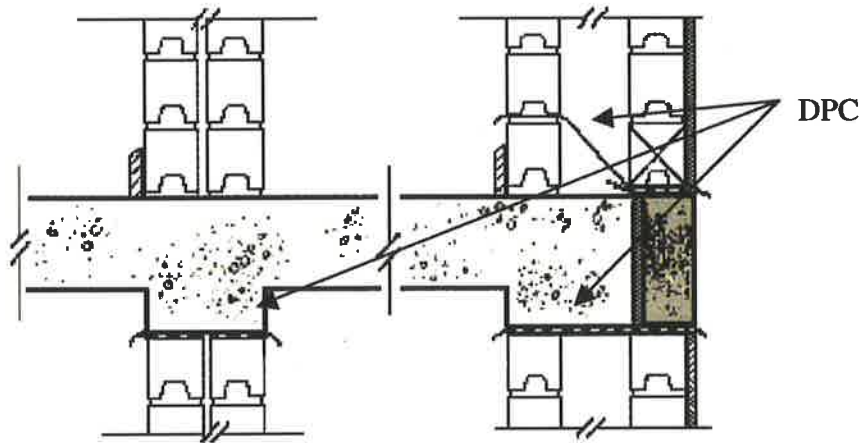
URM Wall to Inter Story Floor Slab DPC Connection Detail
